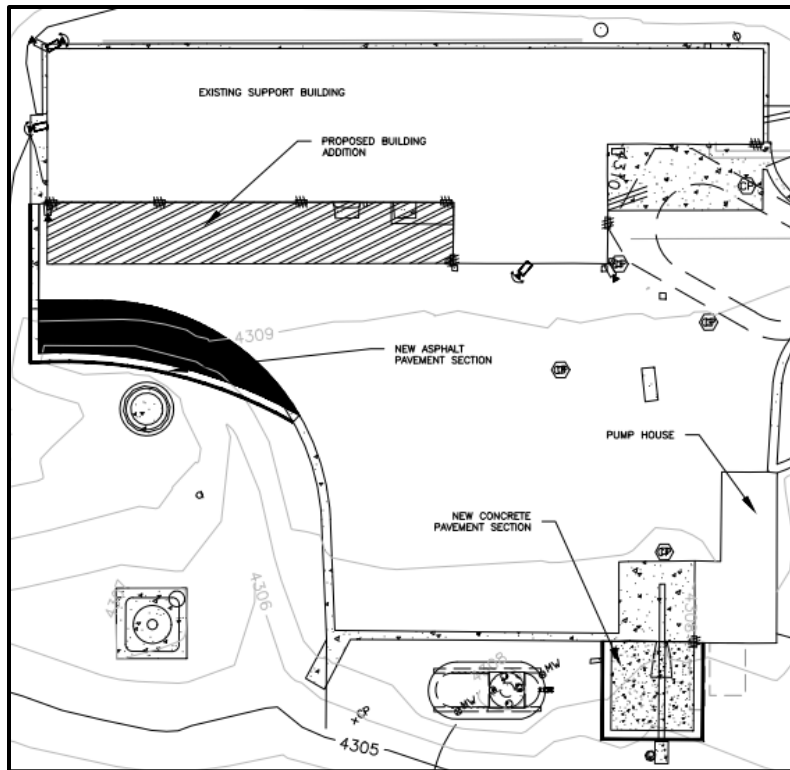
Proposed Support Building and Parking Lot Expansion Areas for MAF G-01.
